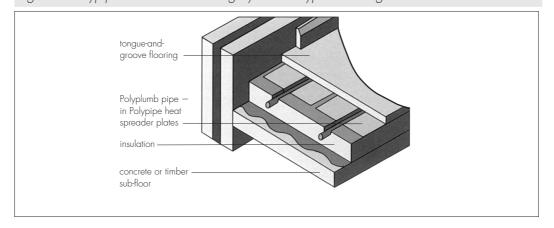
Polypipe Underfloor Heating System — Typical suspended wooden floor installation
